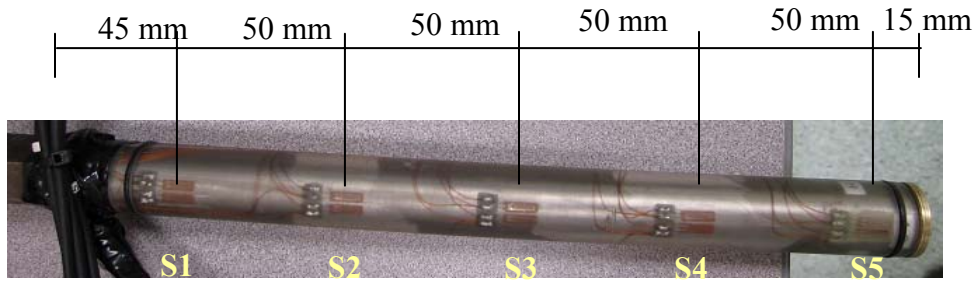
Centrifuge model views and instrumentation layout for tests with embedded pile-raft structure
